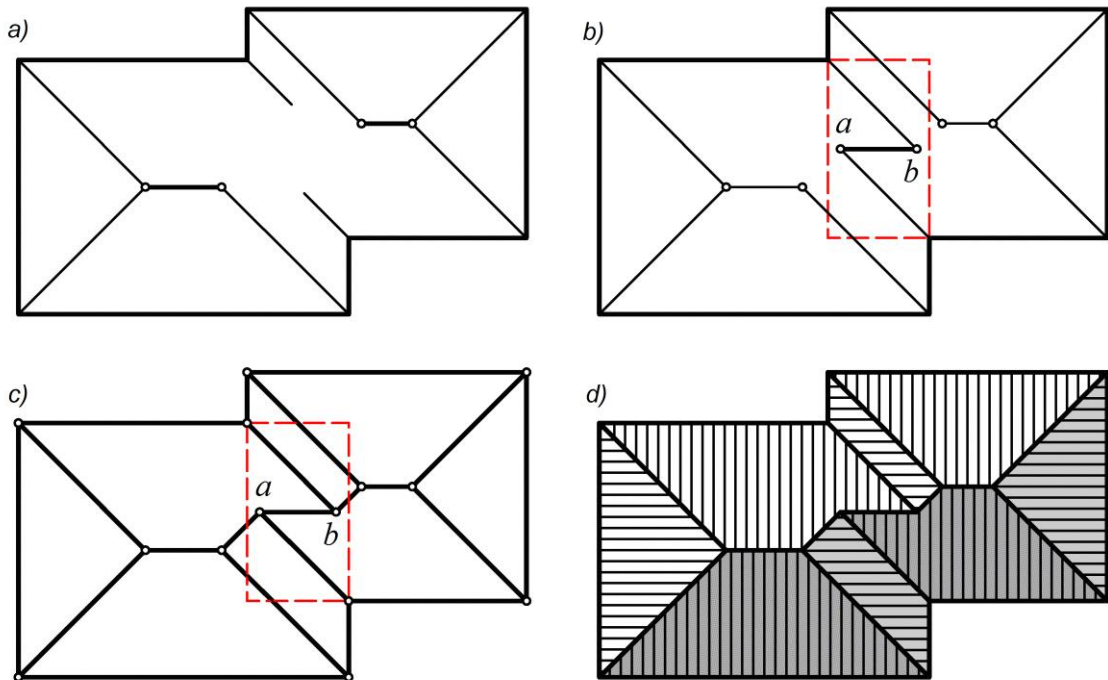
Construction of horizontal projections of intersecting lines of roof slopes
